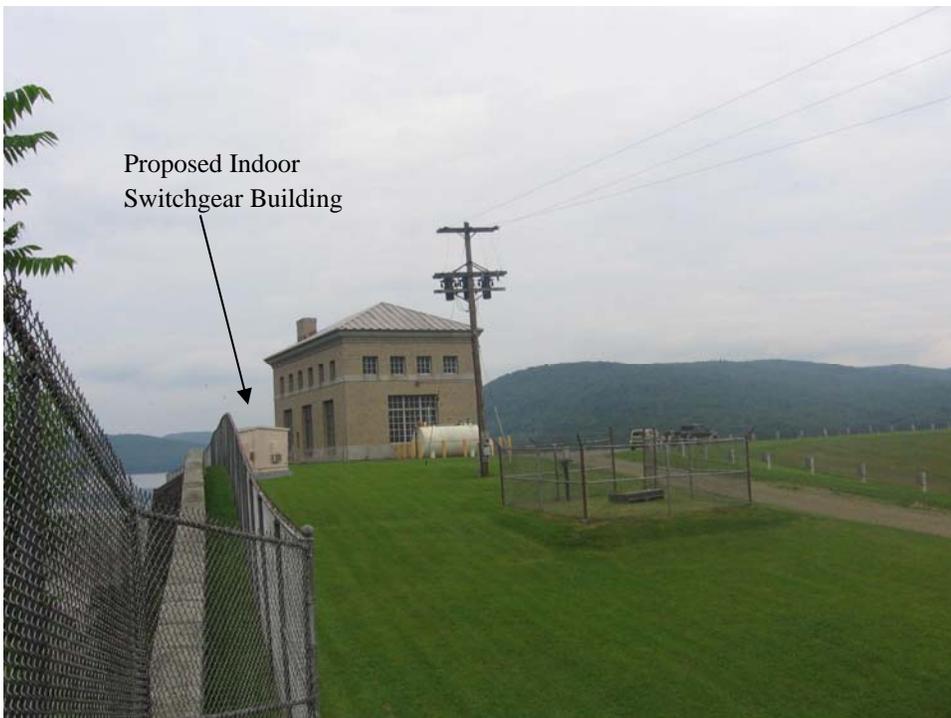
P3 – View of proposed switchgear building location from within restricted area
